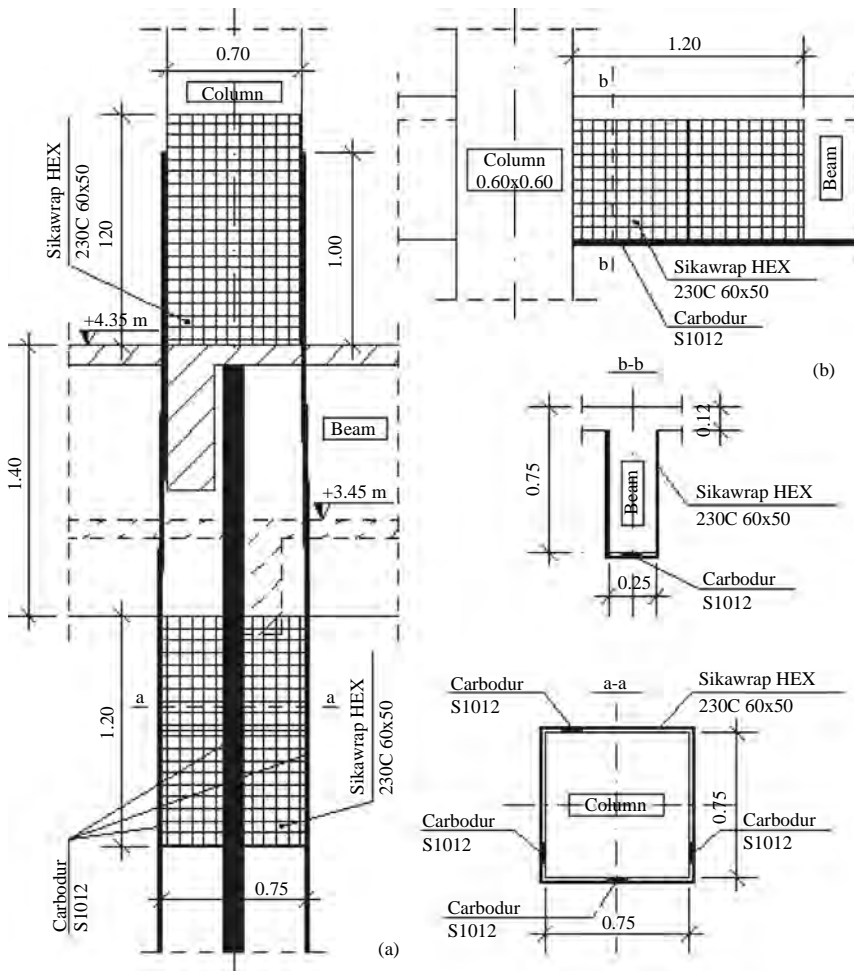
CFRP strengthening details for: (a) column; (b) main girder (Units: m)
